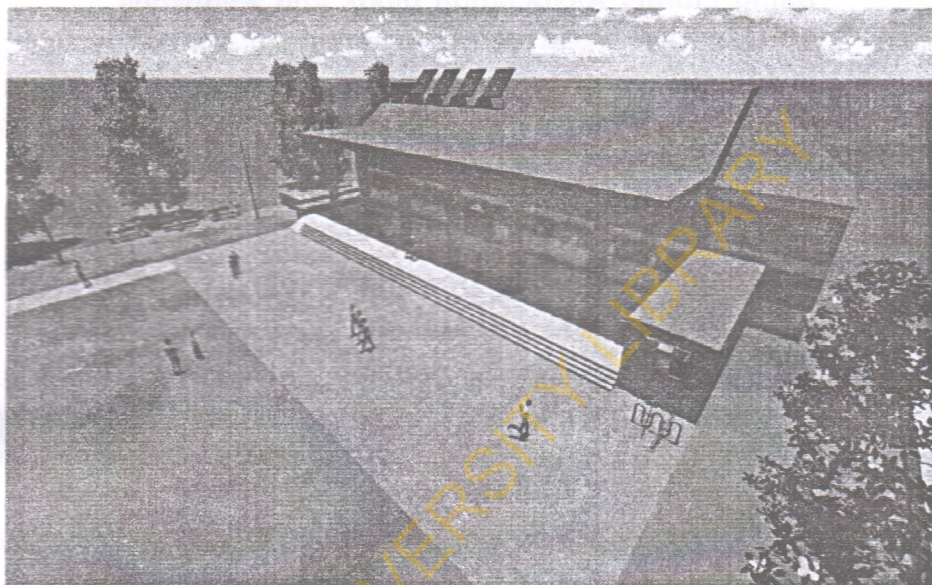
Model of Green Library building with green roof, LED lighting and good ventilation.
